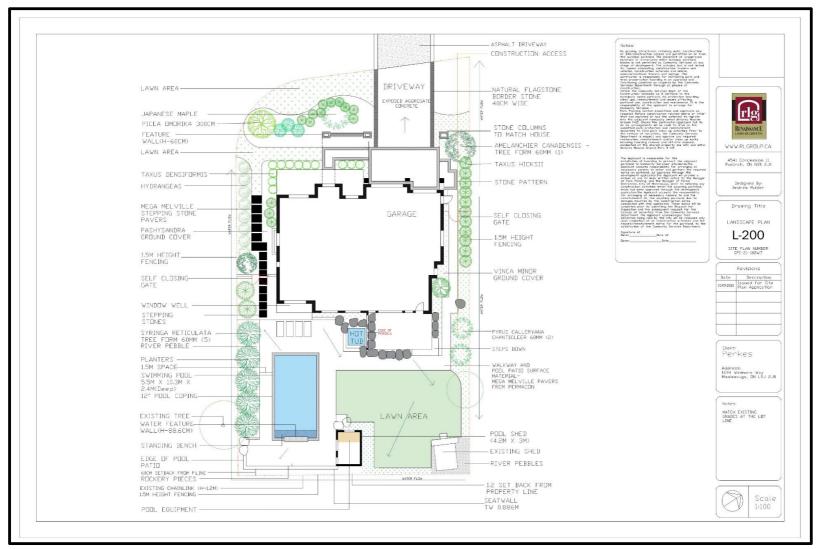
Proposed Development – Landscape Plan (H4H Inc. 2021)
